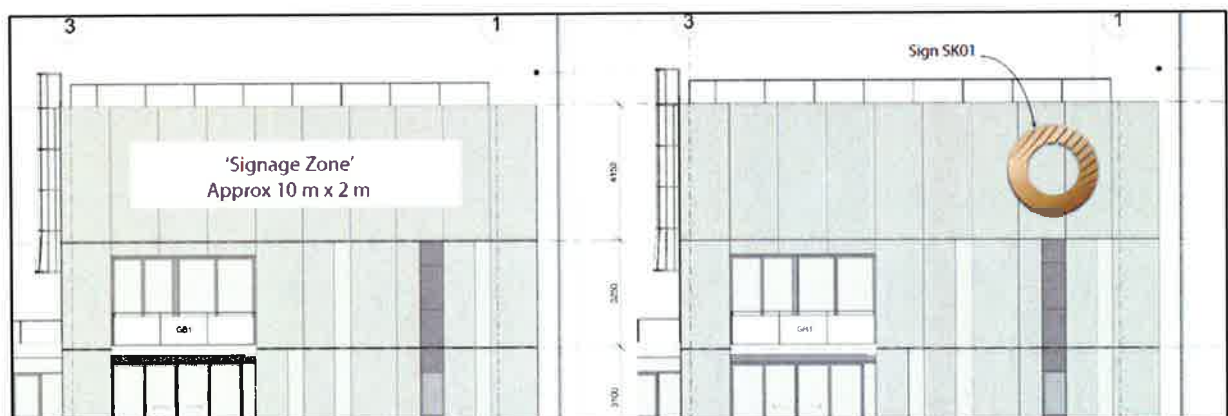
Proposed new building identification signage - Comparison between approved signage zone (left) and proposed sign (right)
